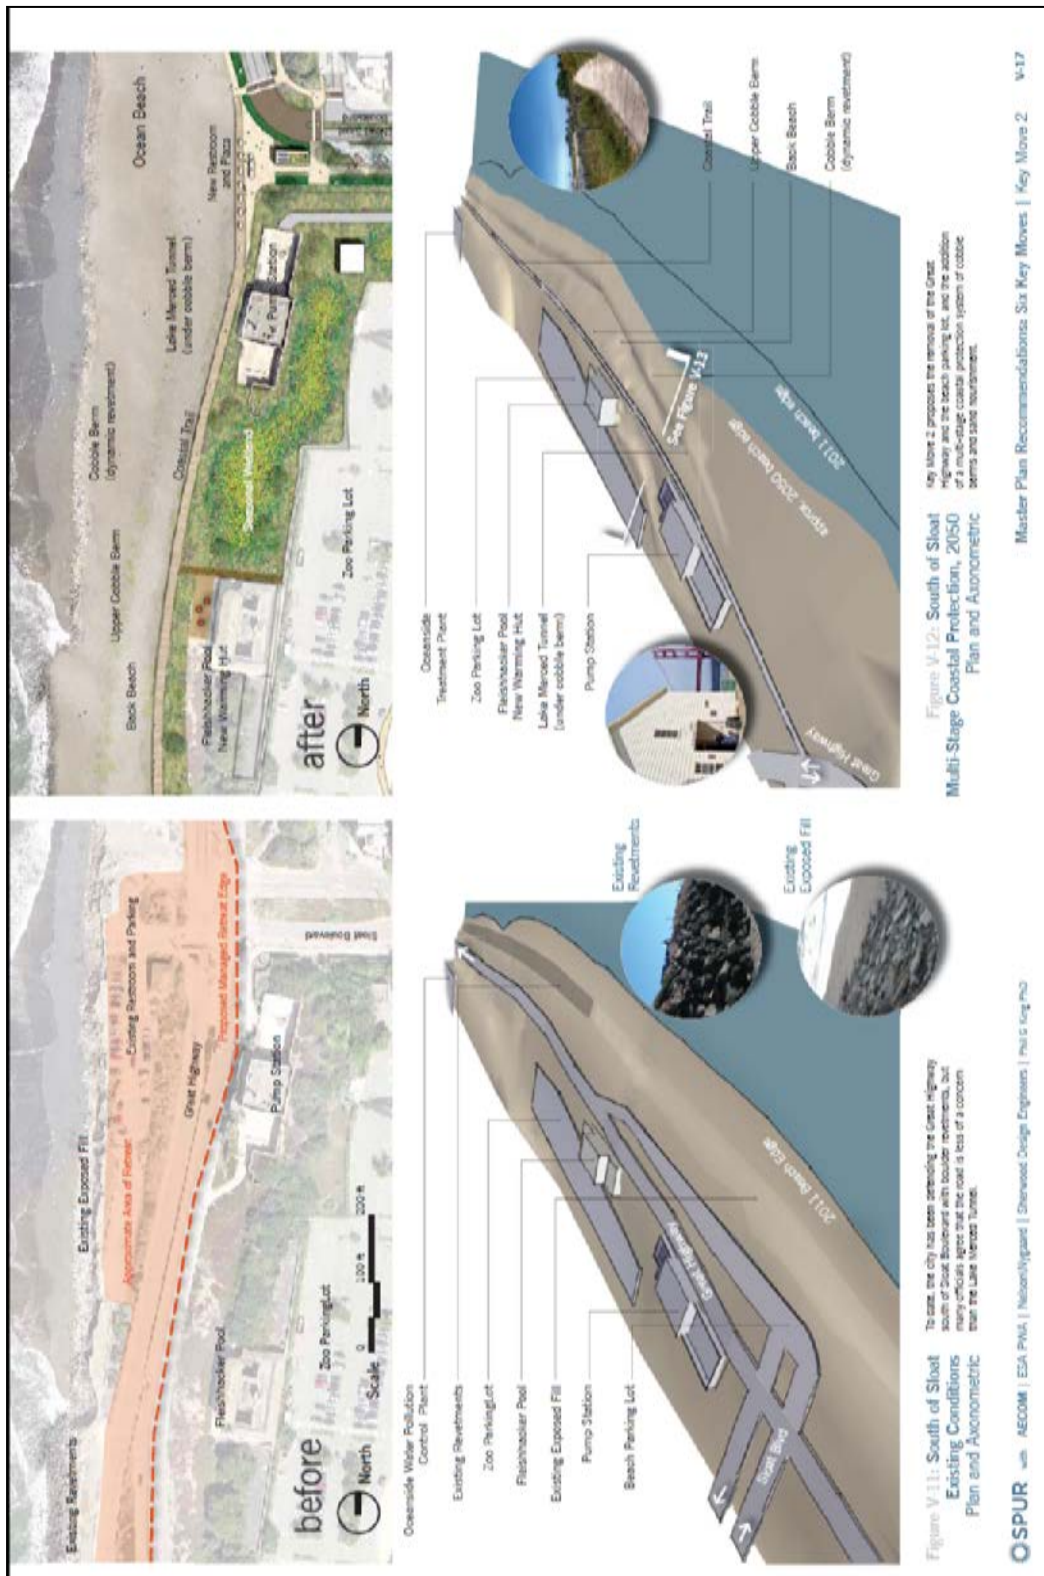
Ocean Beach Master Plan Key Move 2, proposed removal of the Great Highway and parking lots between Sloat Boulevard and Skyline Drive with low profile protection for the Lake Merced Tunnel and other wastewater infrastructure. Graphic Credit: SPUR, 2012.
